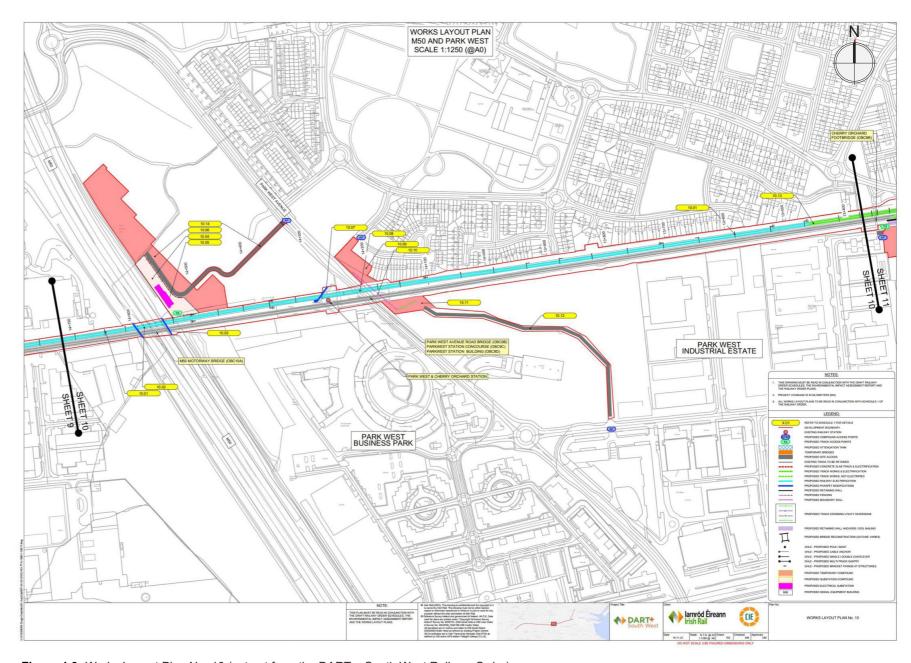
Works Layout Plan No. 10 (extract from the DART + South West Railway Order)
